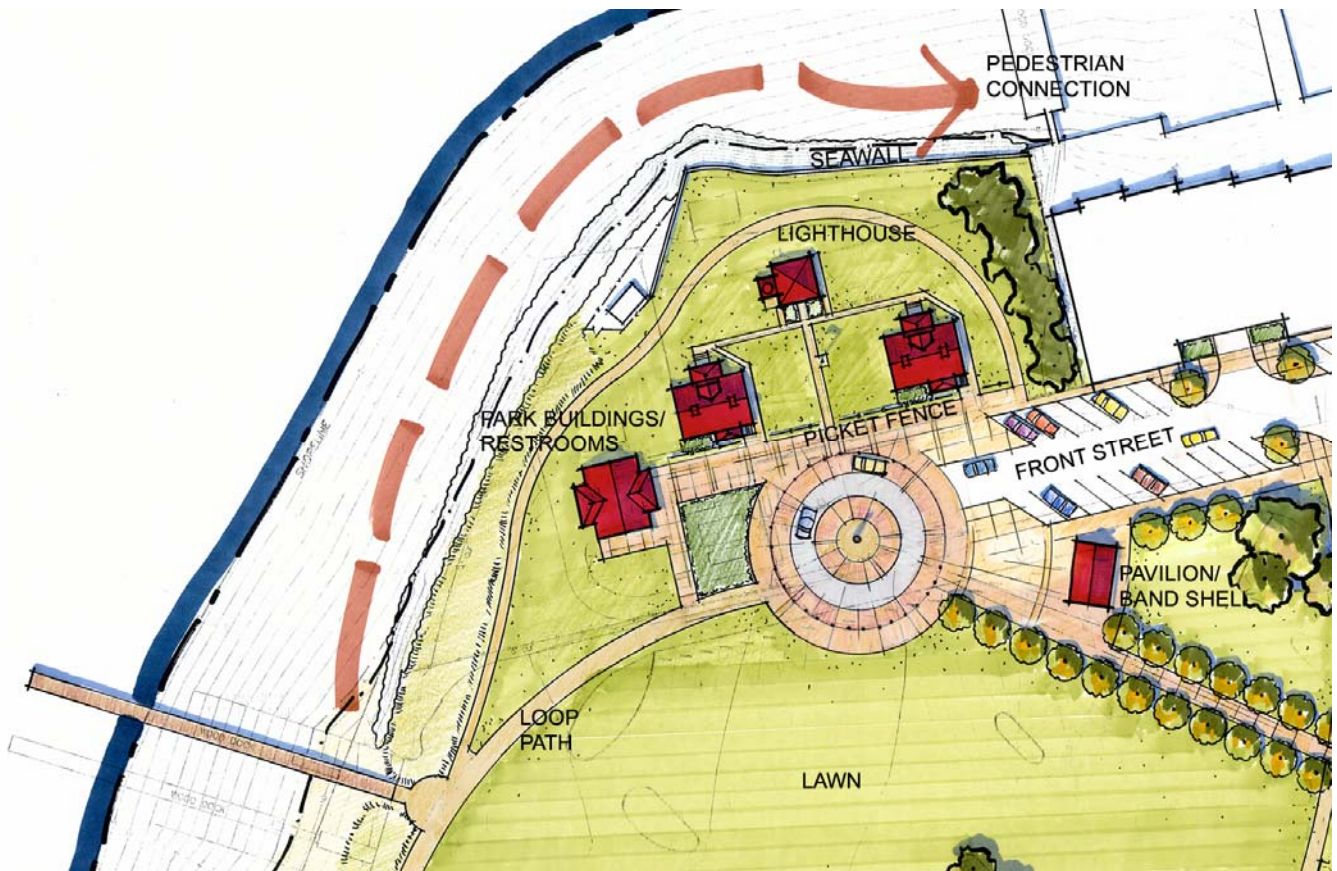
Plan view of lighthouse area with new park building option and turn around on axis with the lighthouse
